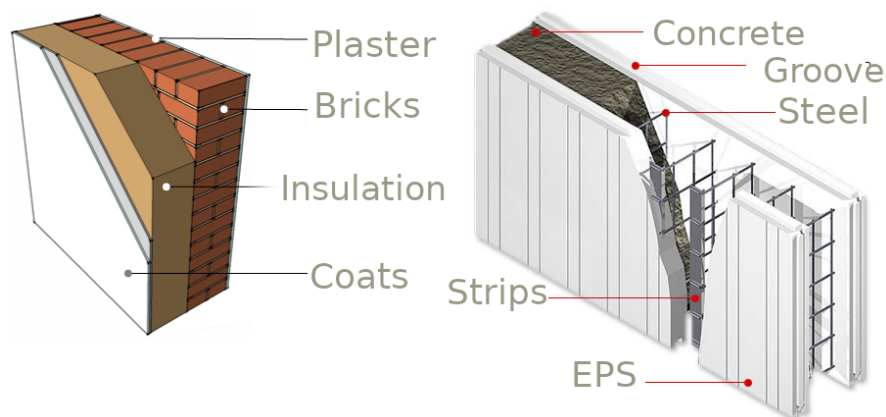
Exterior wall cutaways a) brick wall L[28] b) concrete wall L[29]
